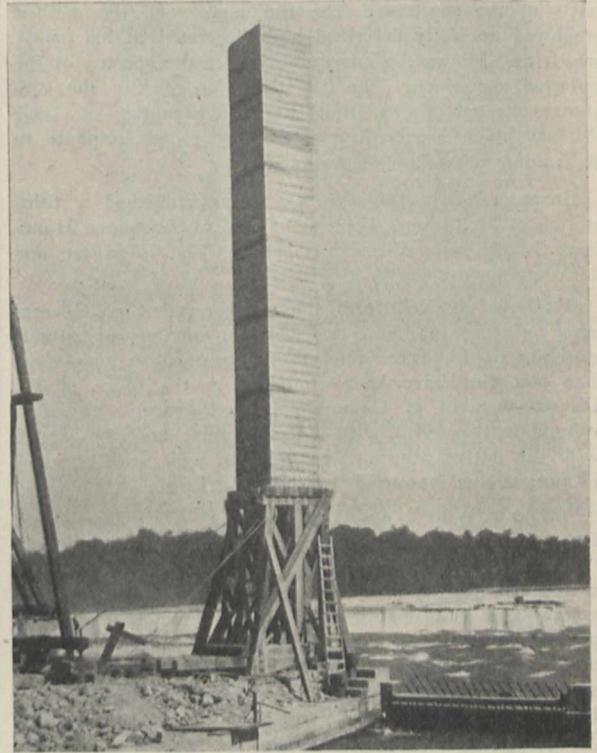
A column of concrete built to be tipped over to form a dam at Niagara Falls.
